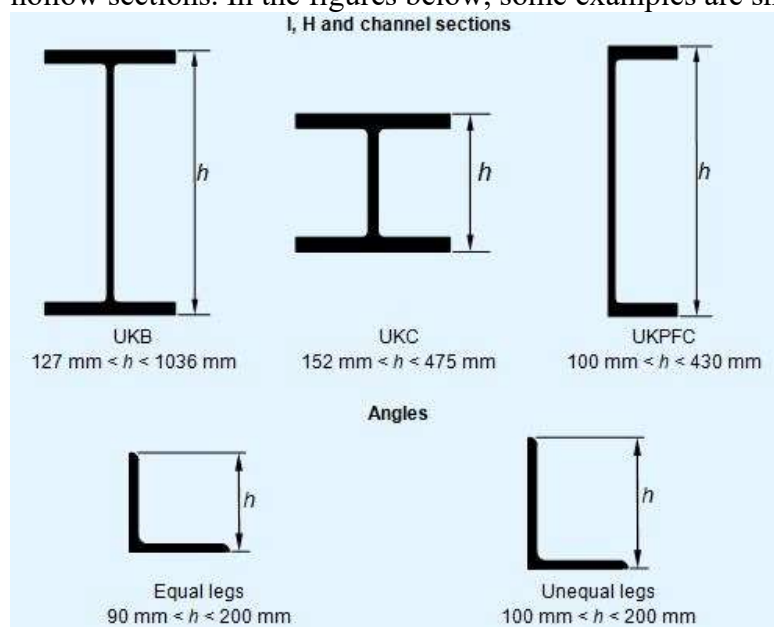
Open steel sections (SteelConstruction.info, n.d.)
